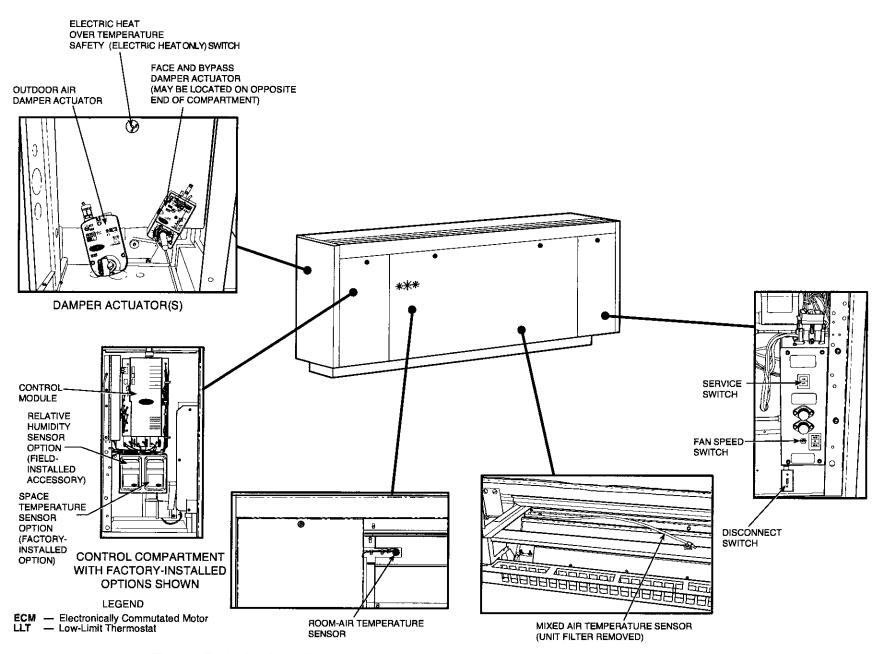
Typical Unit Ventilator Comfort Control Module Sensor, Switch, and Device Locations
